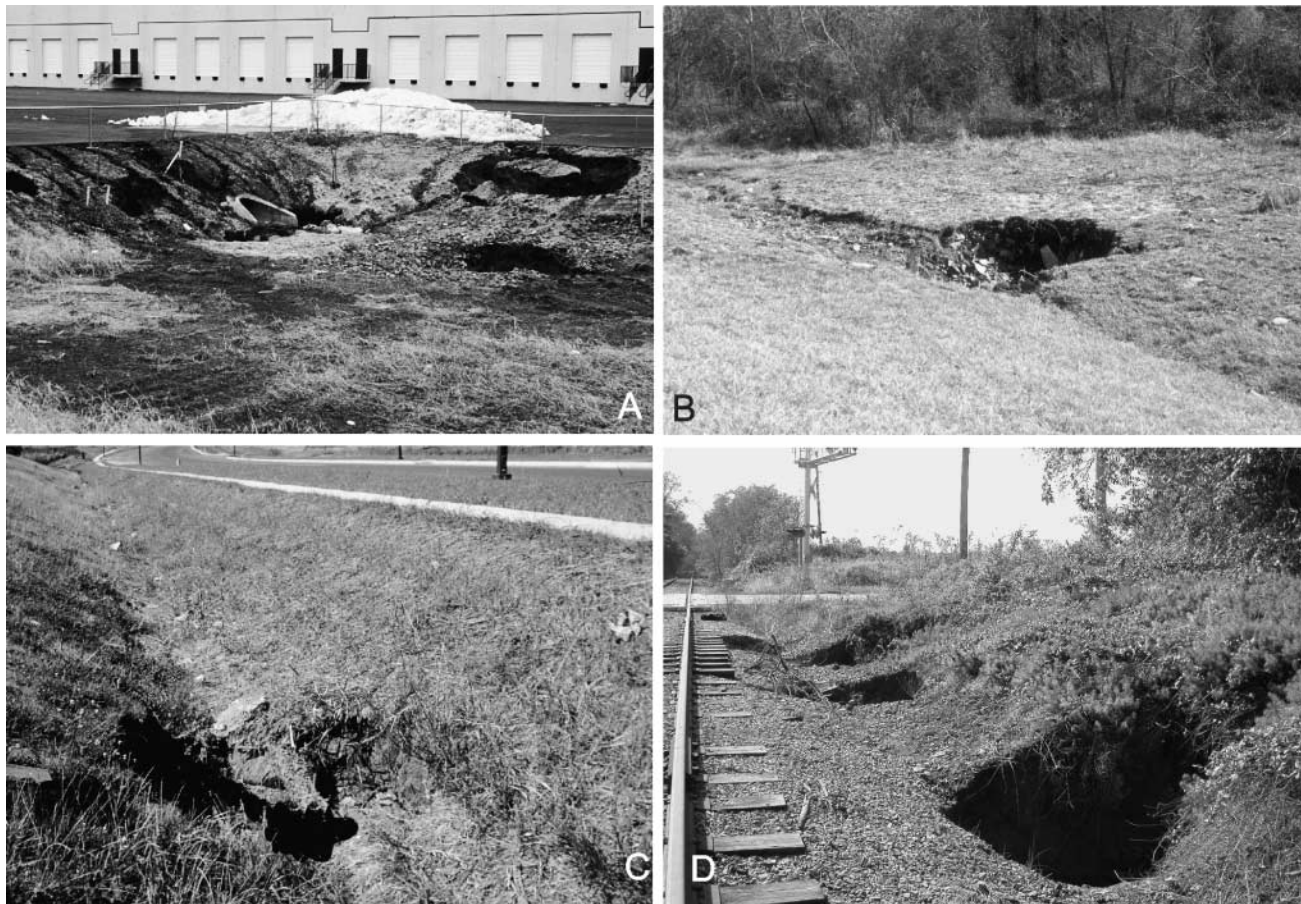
Sinkhole activation and unlined drainage. (A) Storm-water management area north of Buckeytown. (B, C) Unlined road drainage. (D) Unlined drainage adjacent to railroad.
